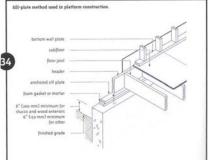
Critical structural details : sill plate construction (Source: CMHC 2001)
